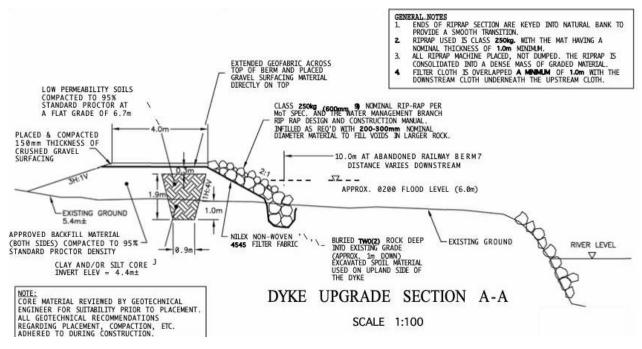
As-built cross section of the Condensory Dike (McElhanney, 2006b)
